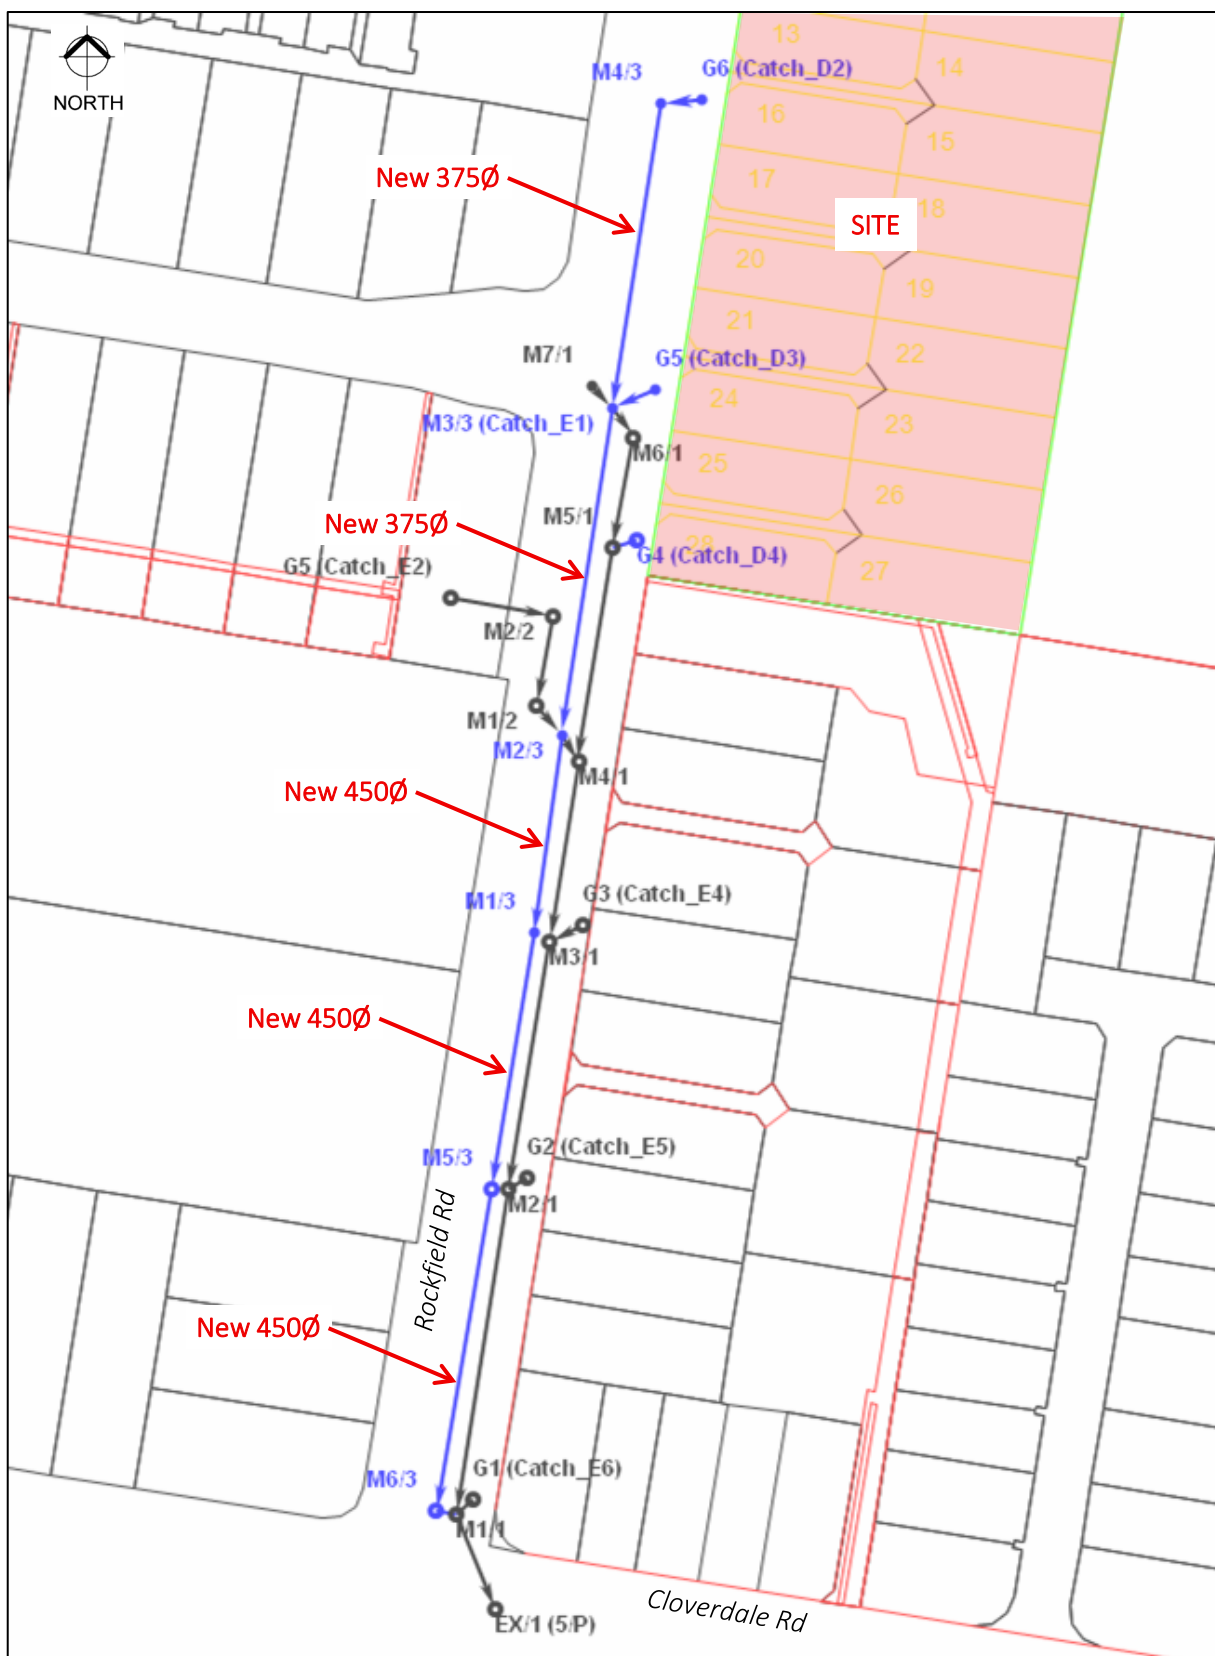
XP-STORM Layout & Proposed Drainage (Schematic Only)
